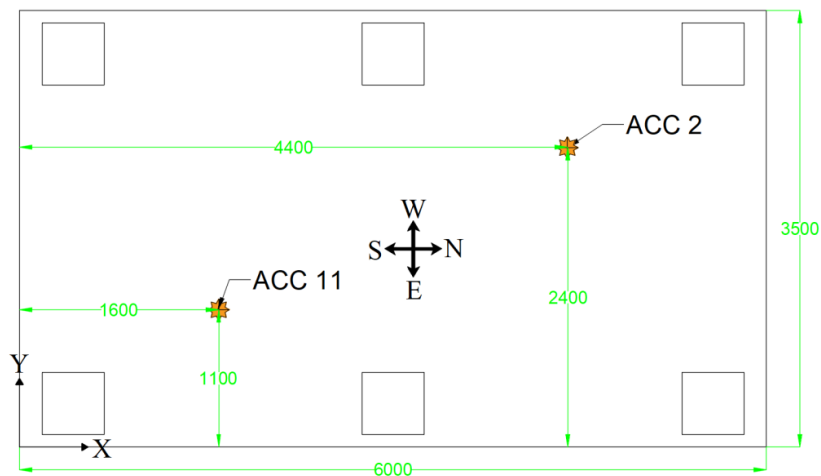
Location of accelerometers underneath the bottom slab (dimensions in mm)
